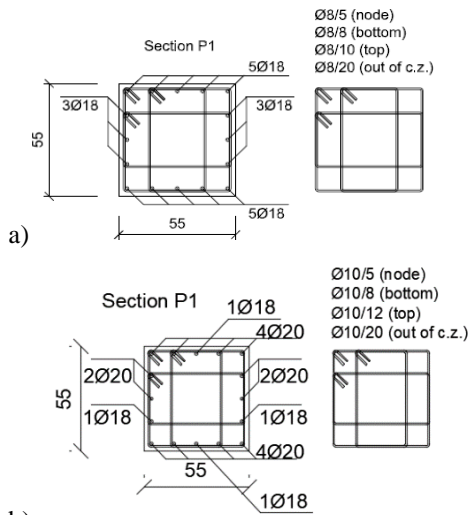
Sections of columns designed using a) B450 C and b) DPF steel reinforcing bars.
